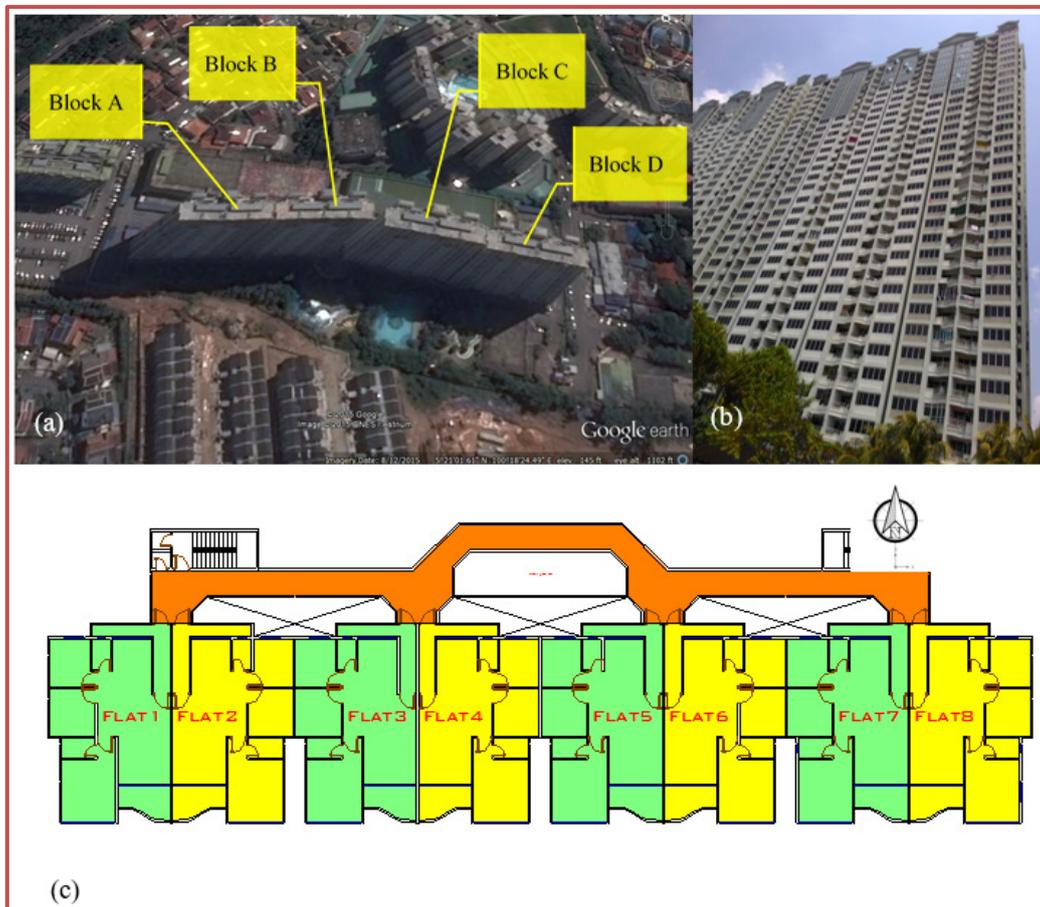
case study (a) Building's blocks (source: Google Earth, 2015), (b) Part of the south elevation, (c) Block layout
